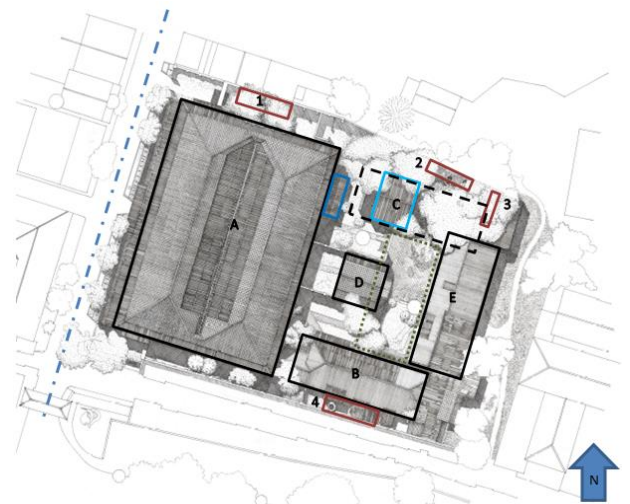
Site plan. (Source: K. R. Kurniawan, 2019)
